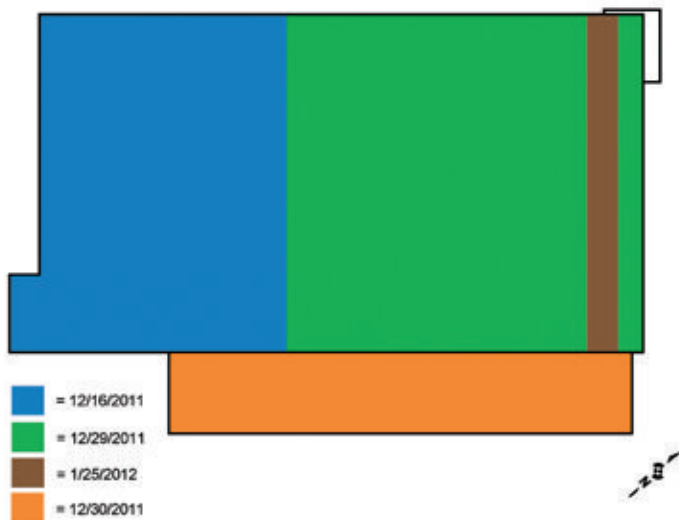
Dates for the new concrete roof deck pours for Case Study 1.
